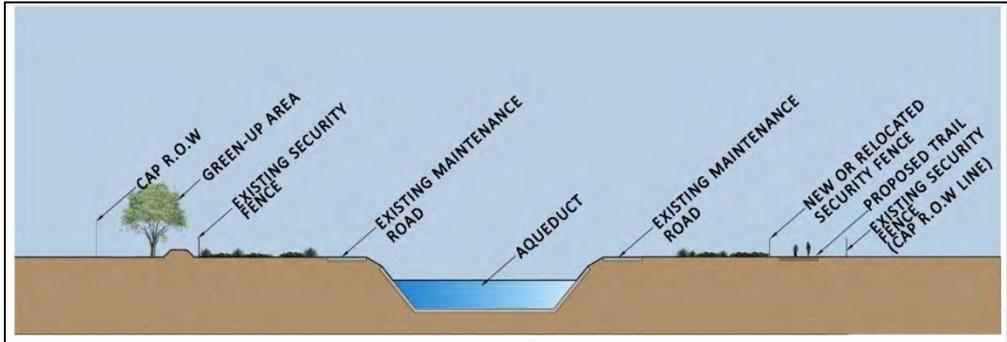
G: Cross Section AJ-1 – Typical of Mile Post 0.0 to Mile Post 0.9
